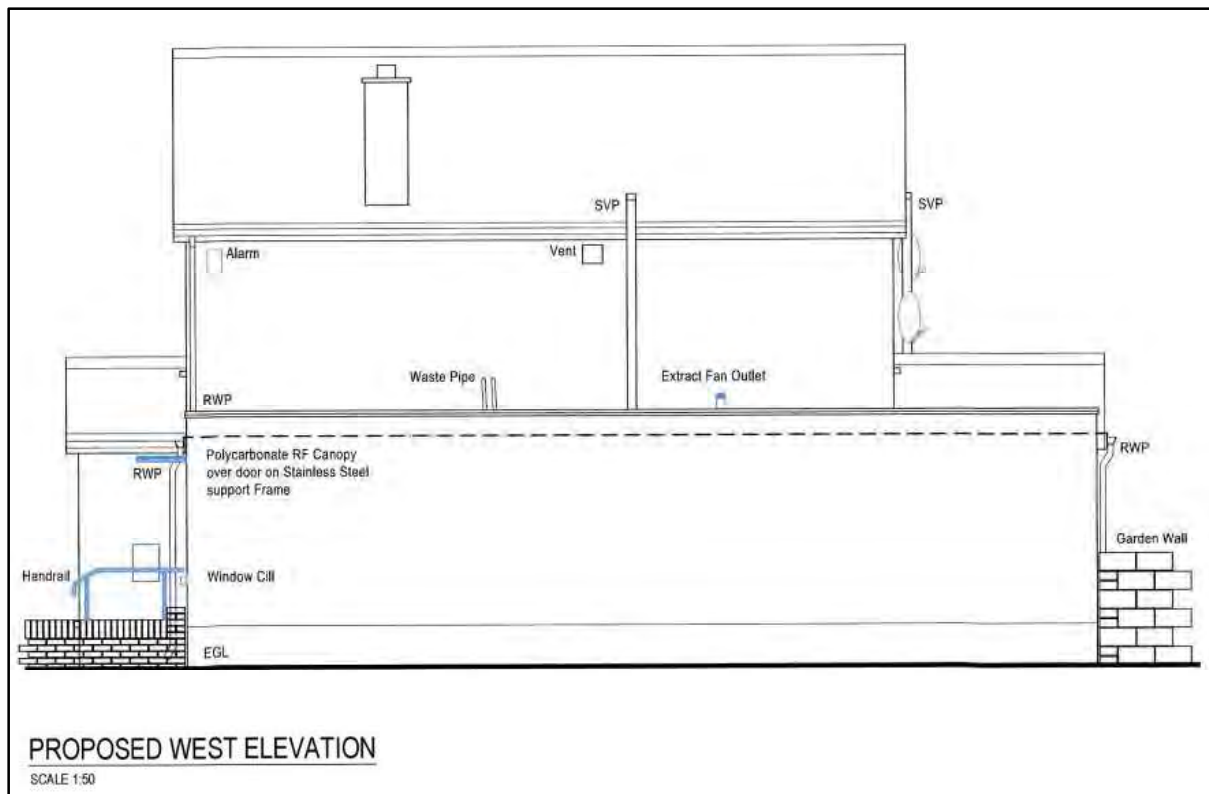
West elevation of proposal with items in blue projecting outside of the existing garage structure.
